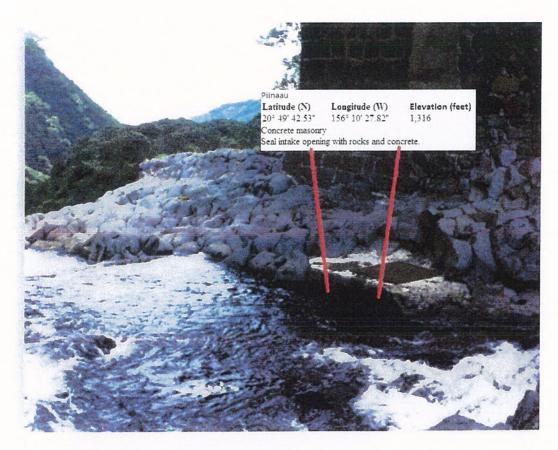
(above): Pi'ina'au at Koolau Ditch (K-31)
